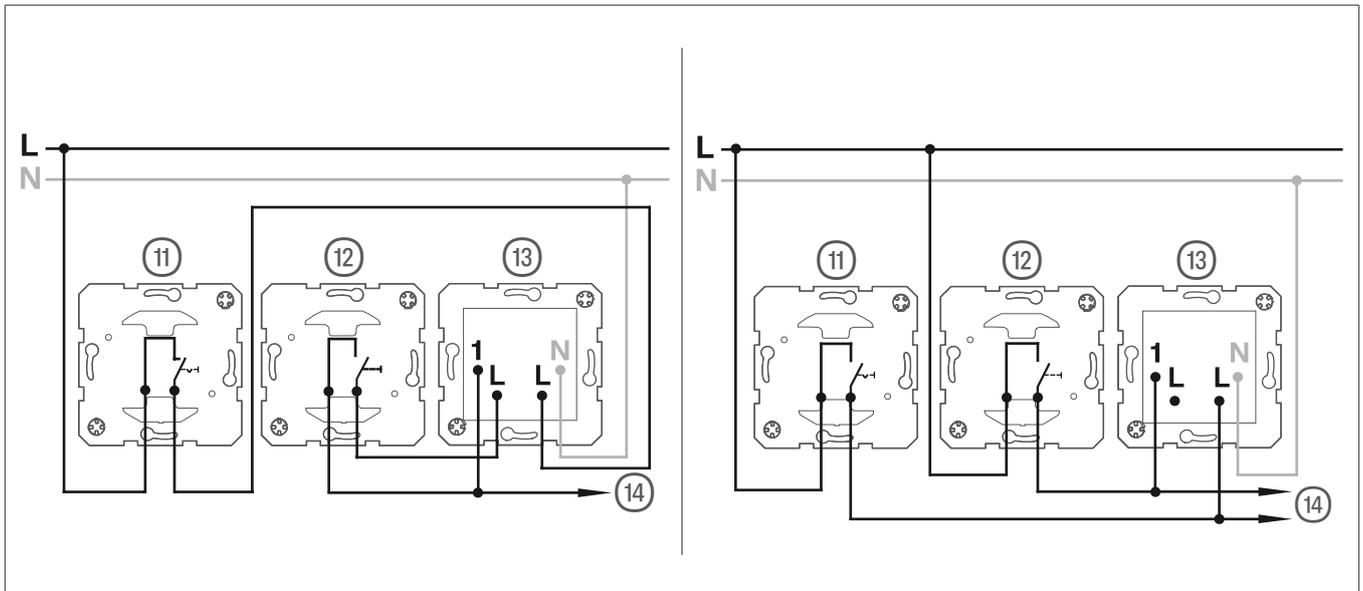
Connection example of colour switching via outer conductor looped (left) / not looped (right)
